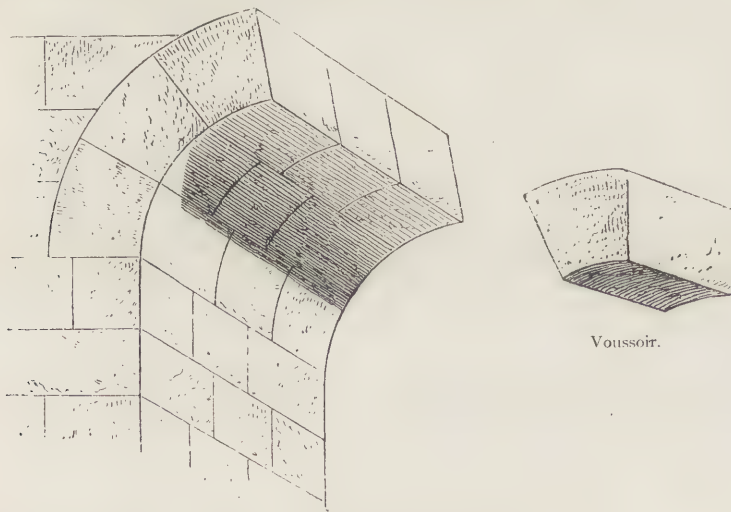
THE ELEMENTS OF ARCH CONSTRUCTION.
